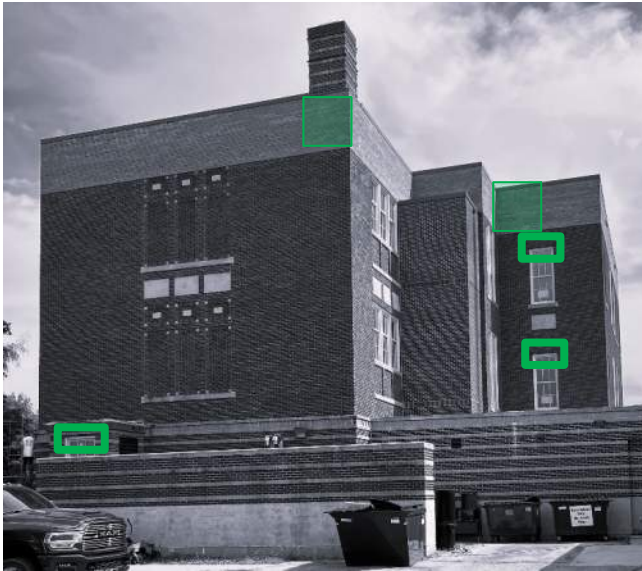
& 9: West/Southwest Façade – Masonry failure locations
